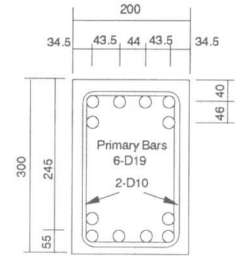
Cross section of specimen and arrangement of longitudinal bars (mm)
